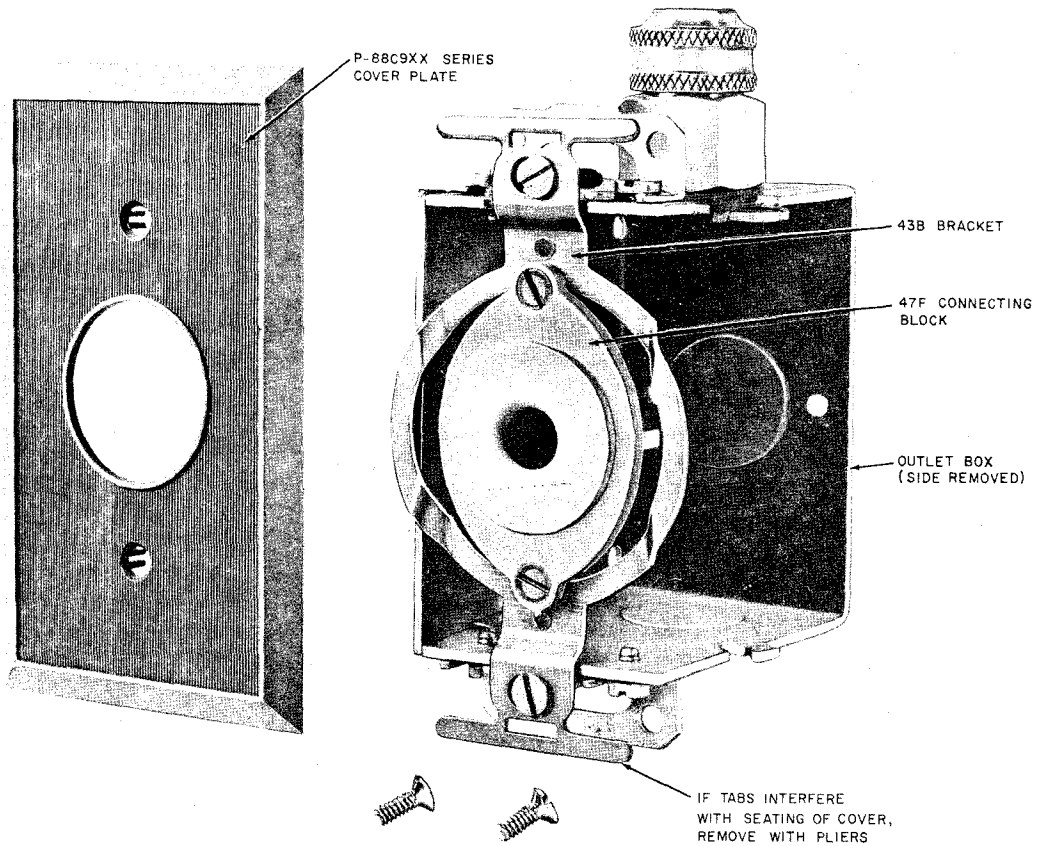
47-Type Connecting Block Mounted in Standard Electrical Outlet Box (Front View)
